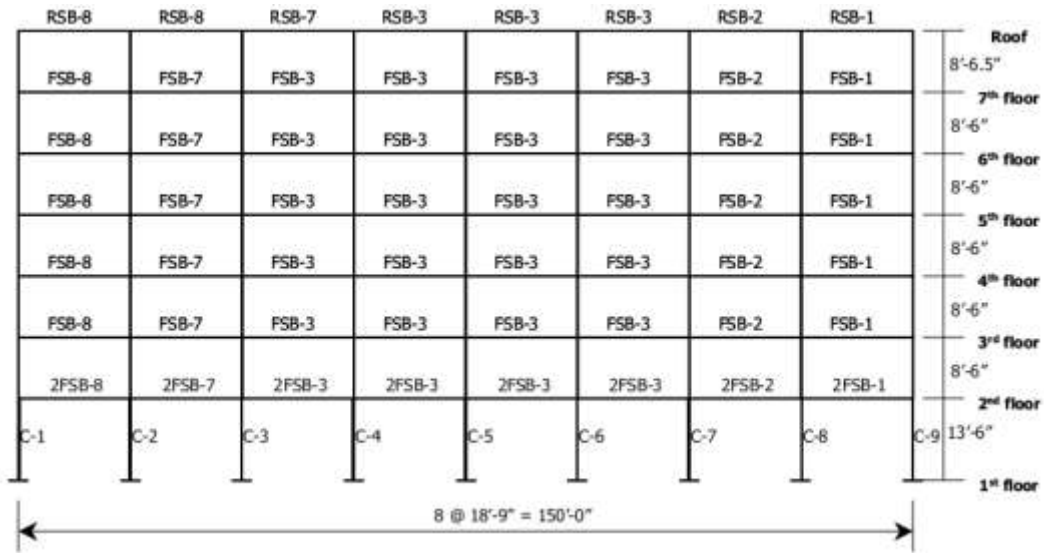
South frame elevation of Van Nuys Hotel (adapted from Krawinkler 2005).
